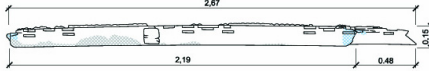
Panelwork proposed reconstruction. Longitudinal section.
